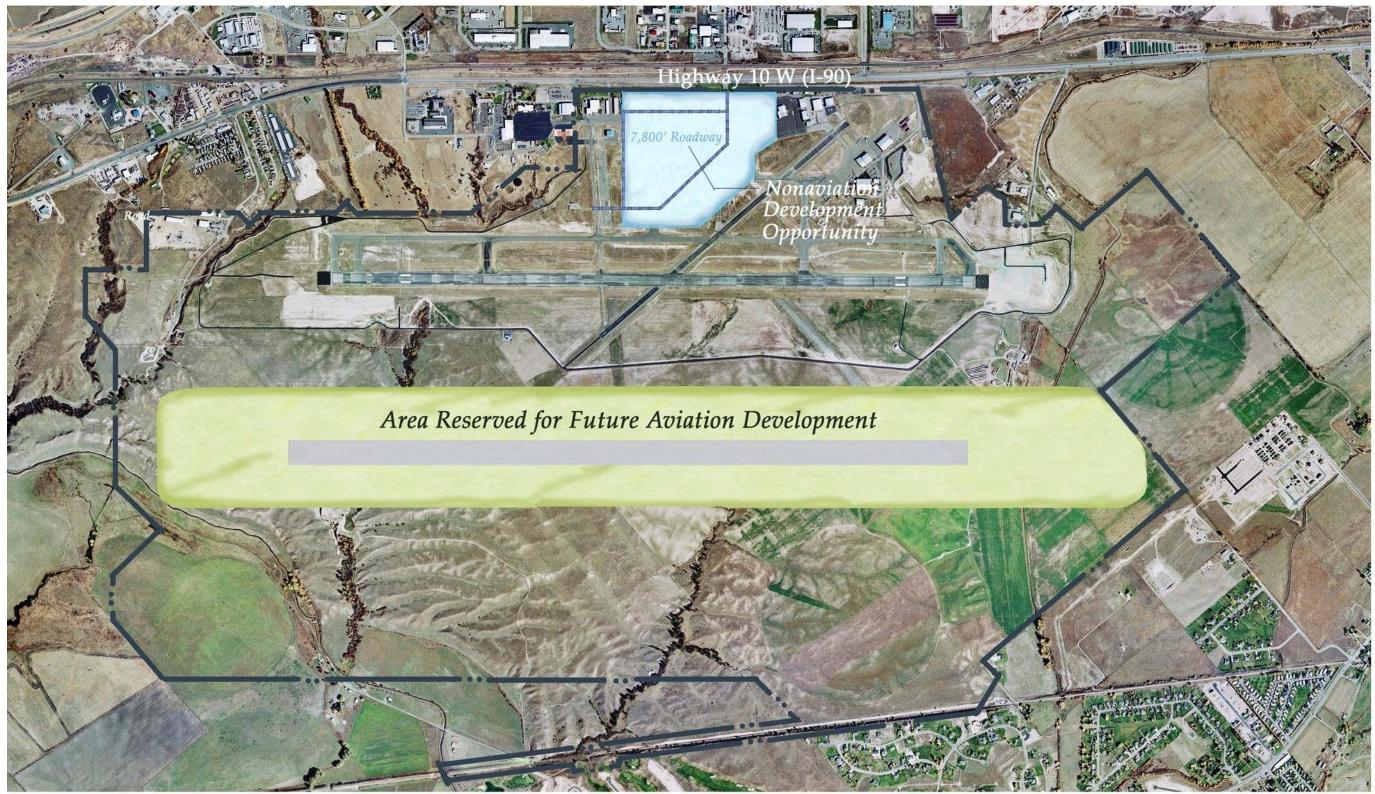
Conceptual Plan 4 Access Road Alternative
